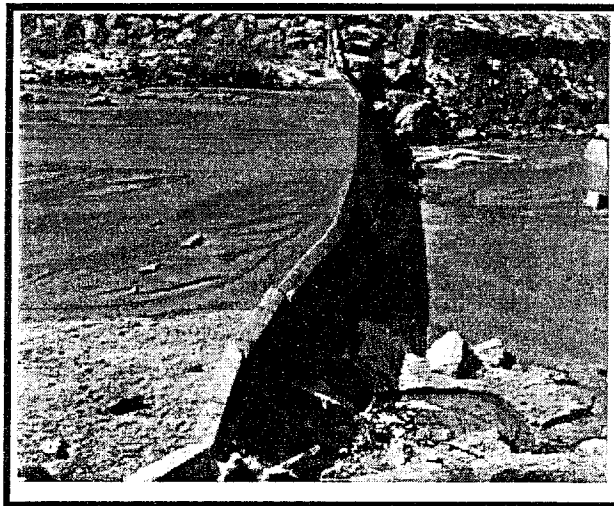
Failing grade control structure, Cottonwood Creek, Colorado.
